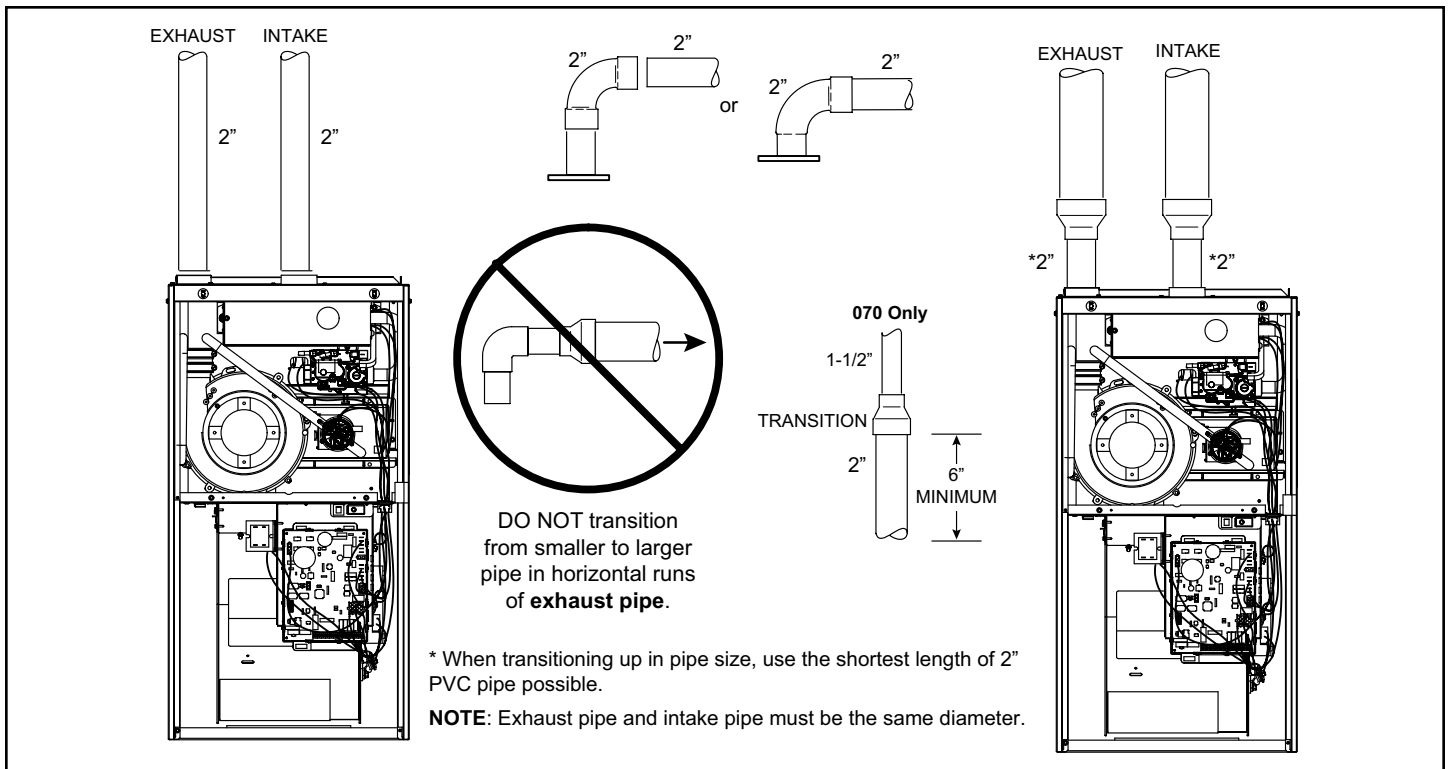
Typical Exhaust and Intake Pipe Connections and Condensate Trap Installation in Upflow Applications
